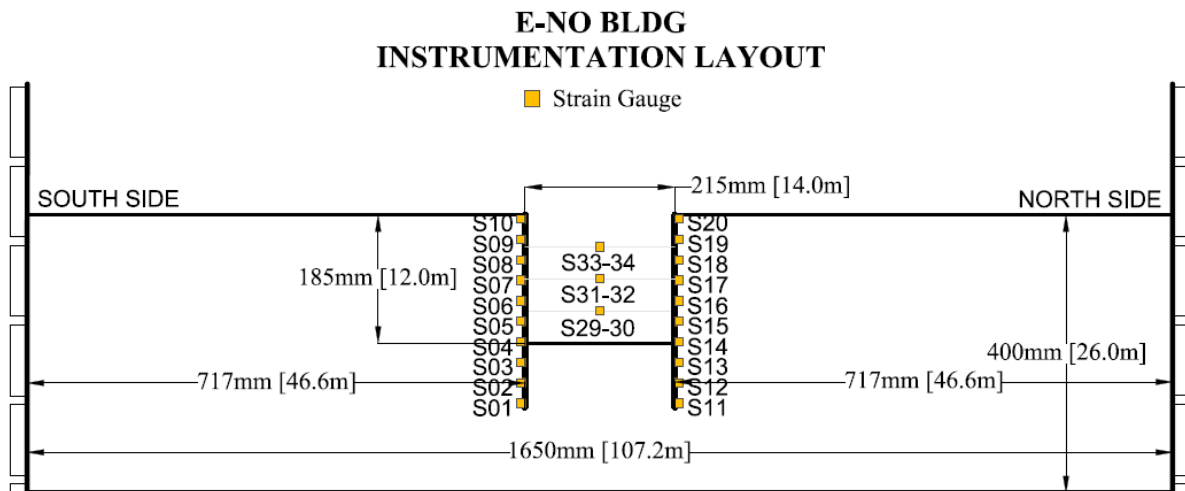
E-No Bldg elevation view of strain gauges mounted on the excavation walls and struts.
